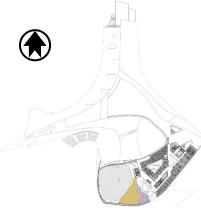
QFIS Second Floor Plan-http://alfozanaward.org
